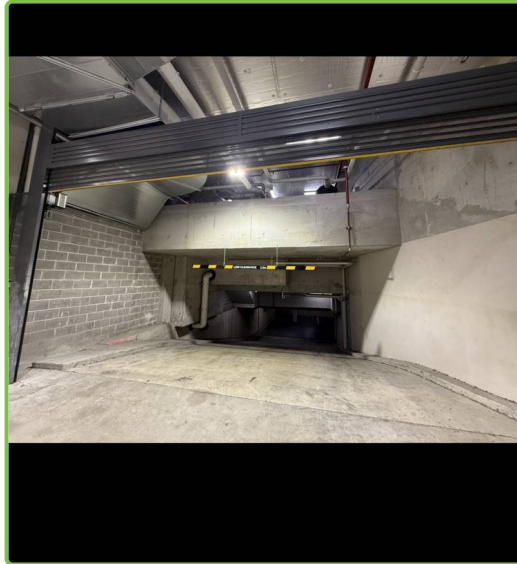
Site reference photograph showing the mezzanine level, structural beam, concrete upturn wall, and driveway circulation area below. This is the location requiring height safety access compliance.
